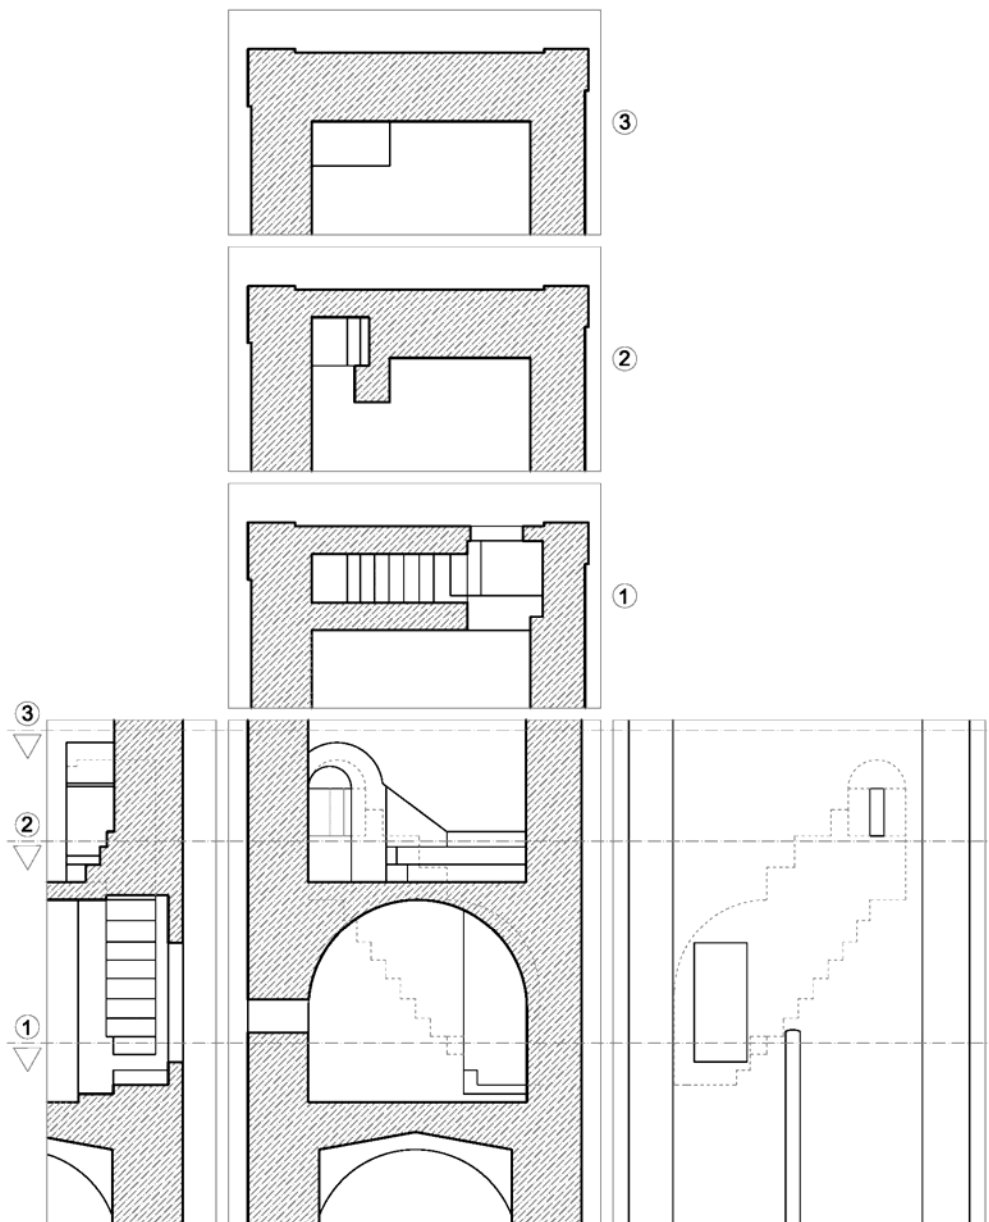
CAD detailing of the staircase in the second level of the bell-tower. Pablo Bañasco, 2018.
